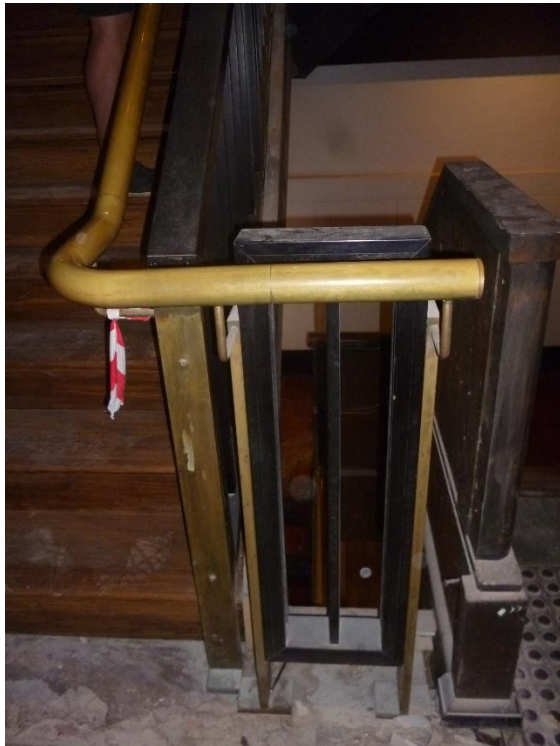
Staircase Balustrade detail located at the interiors of Hotel Steyne.
